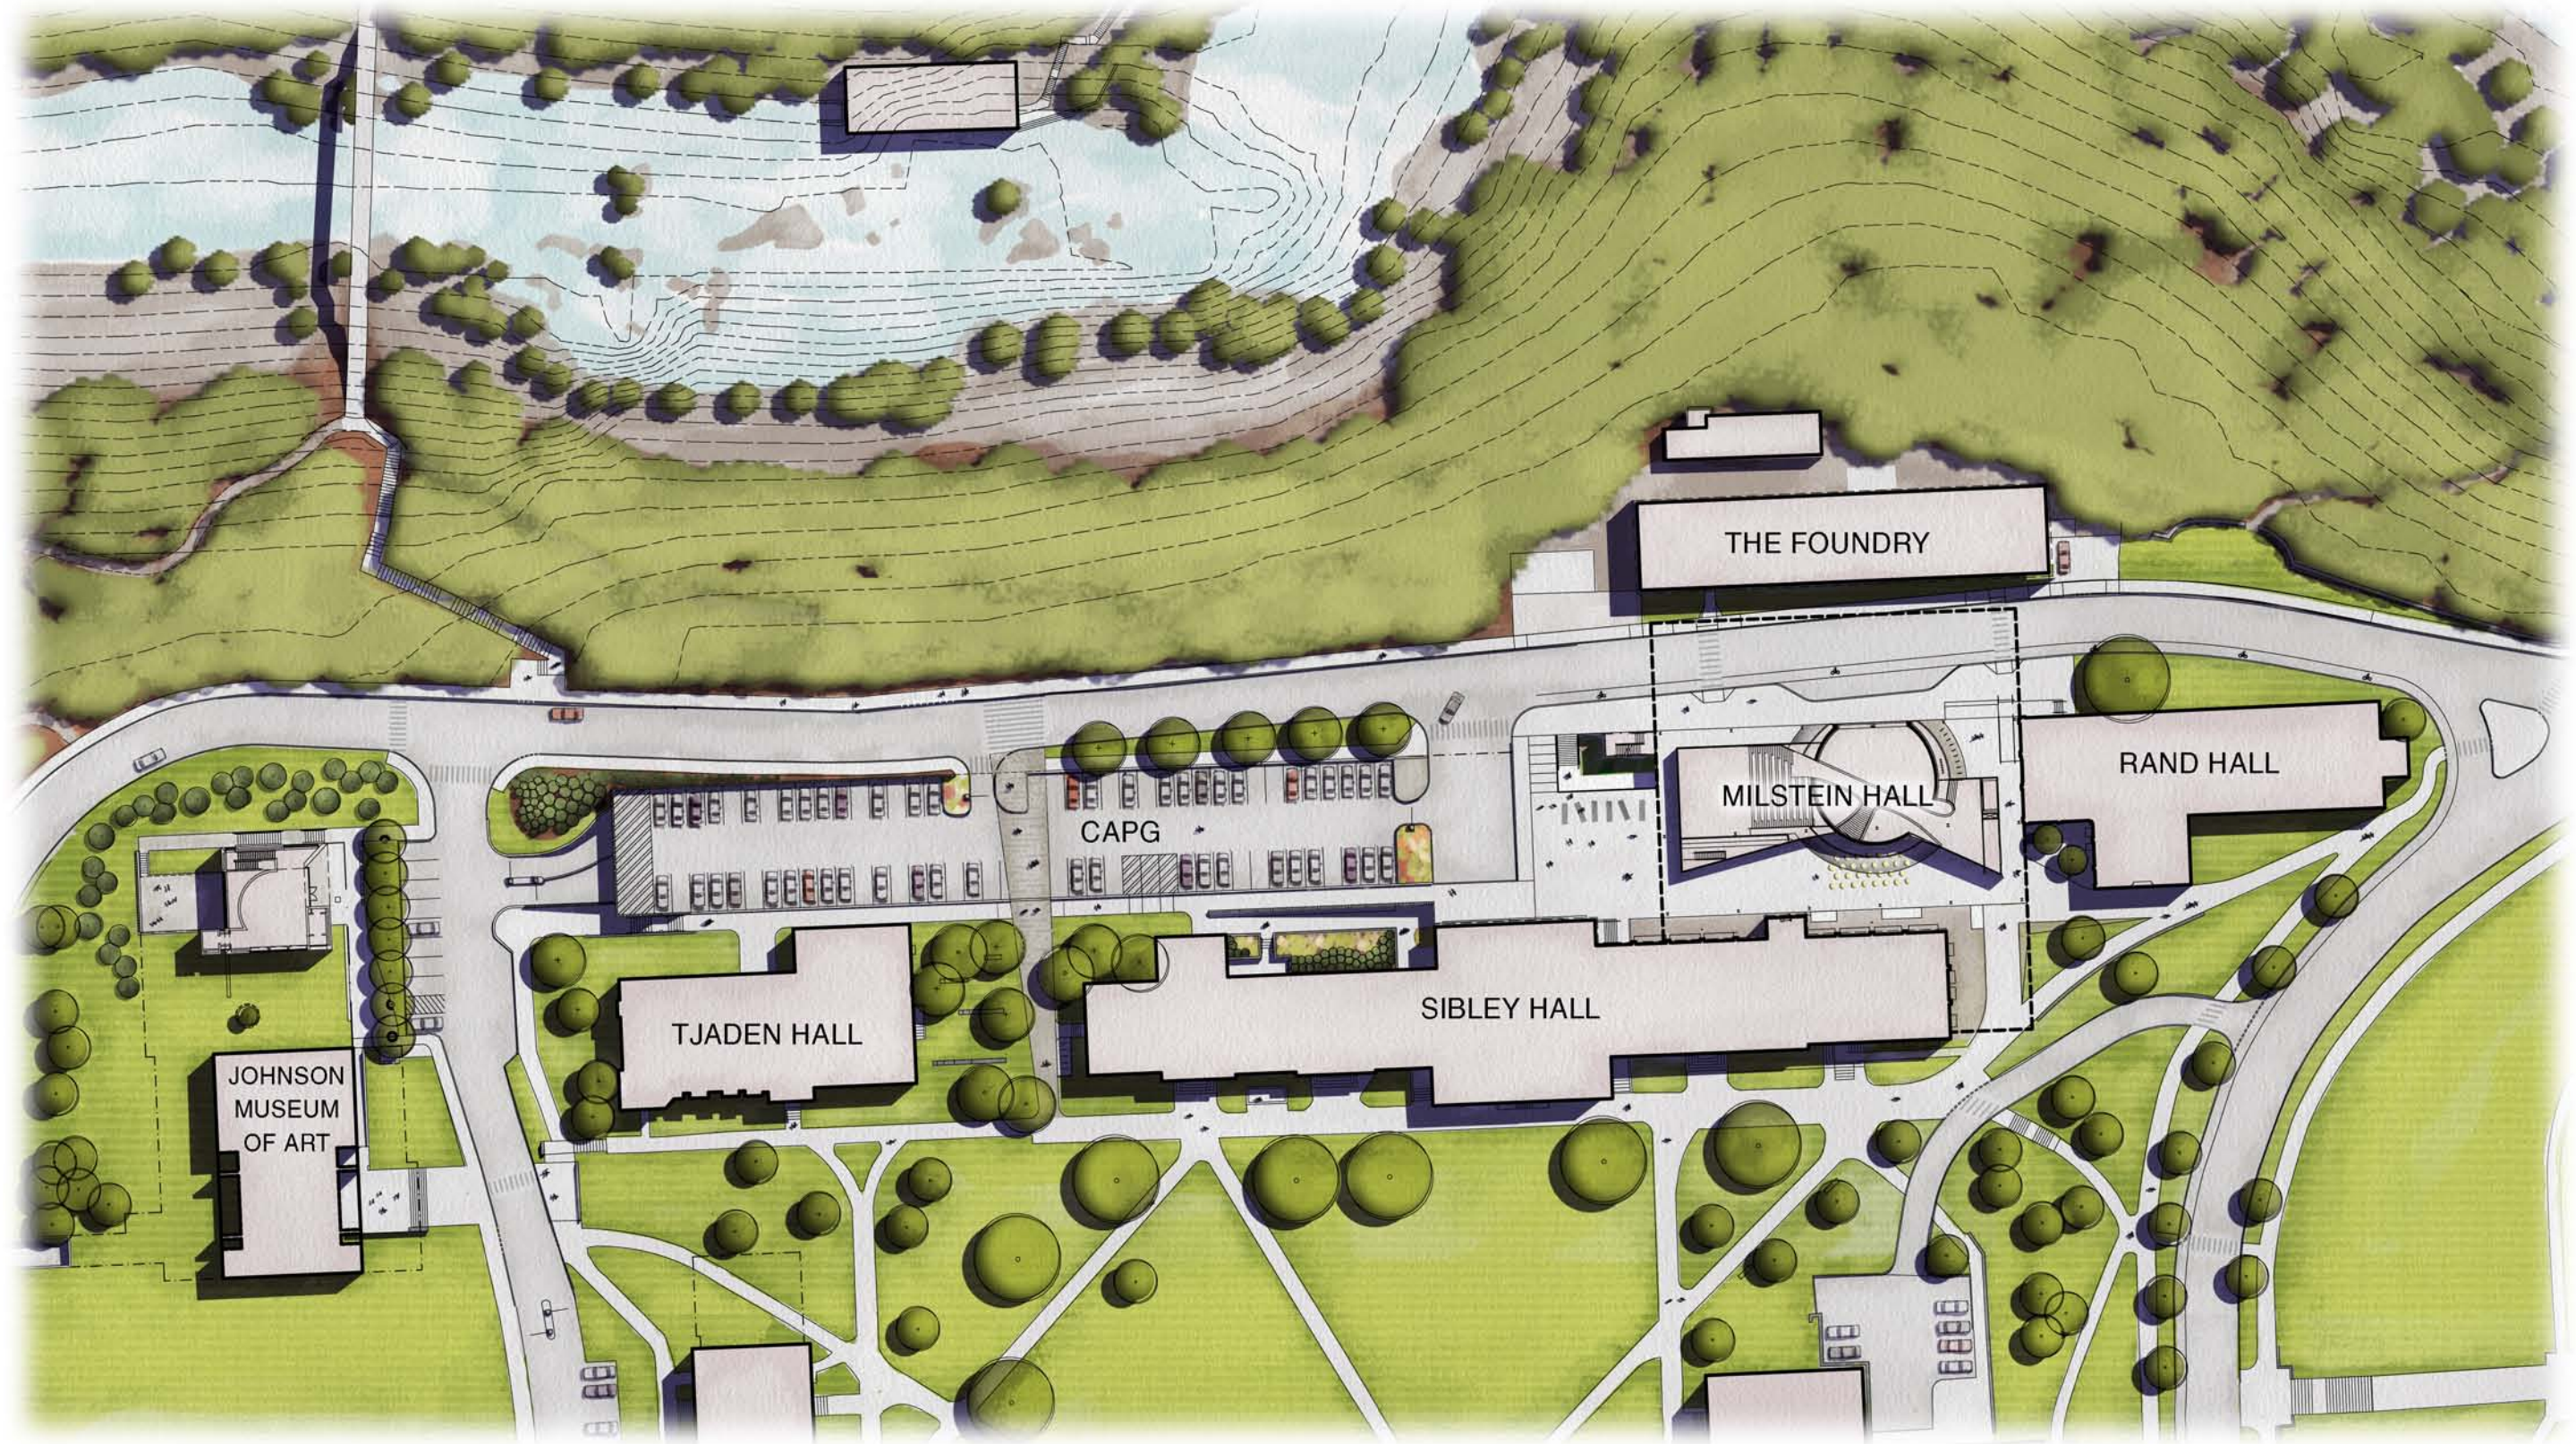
University Avenue streetscape proposal, with sidewalk on north and south sides of the street
